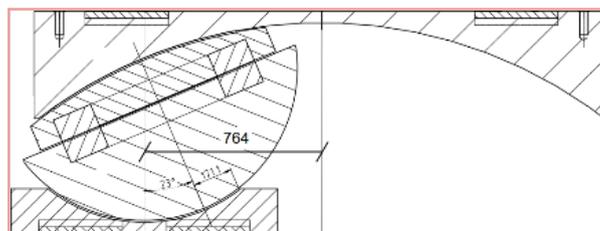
Cross-section of designed non-standard pendulum bearing – with the two-part central calotte having cylindrically shaped upper and lower sliding surfaces.
